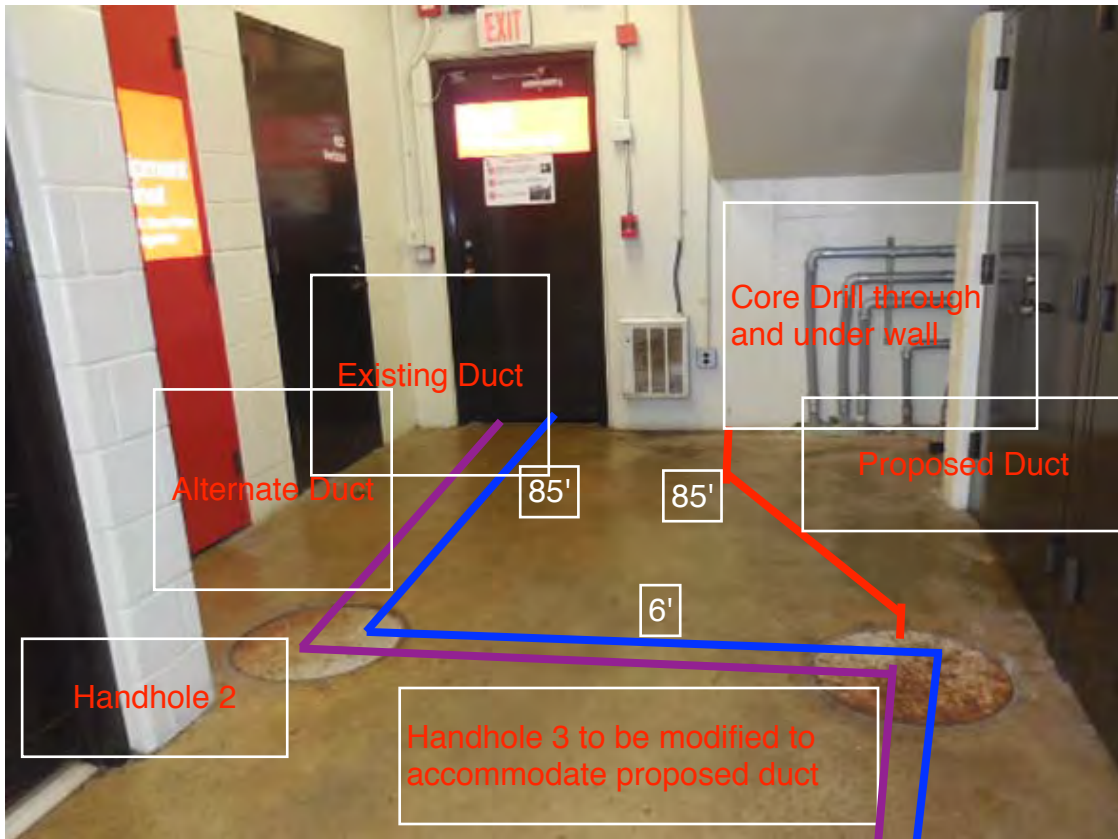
Existing, alternate and proposed ducts in back room corridor.
